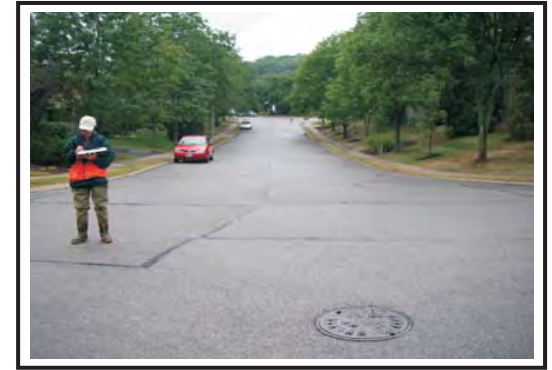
Roadway Right-of-Way; SR 32 Divided Roadway; Facing Northwest
